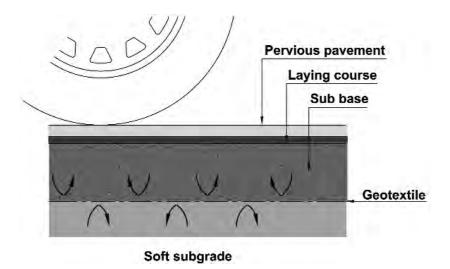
Geotextile requirement to provide sub-grade layer separation (adapted from Pratt et al, 2001)
